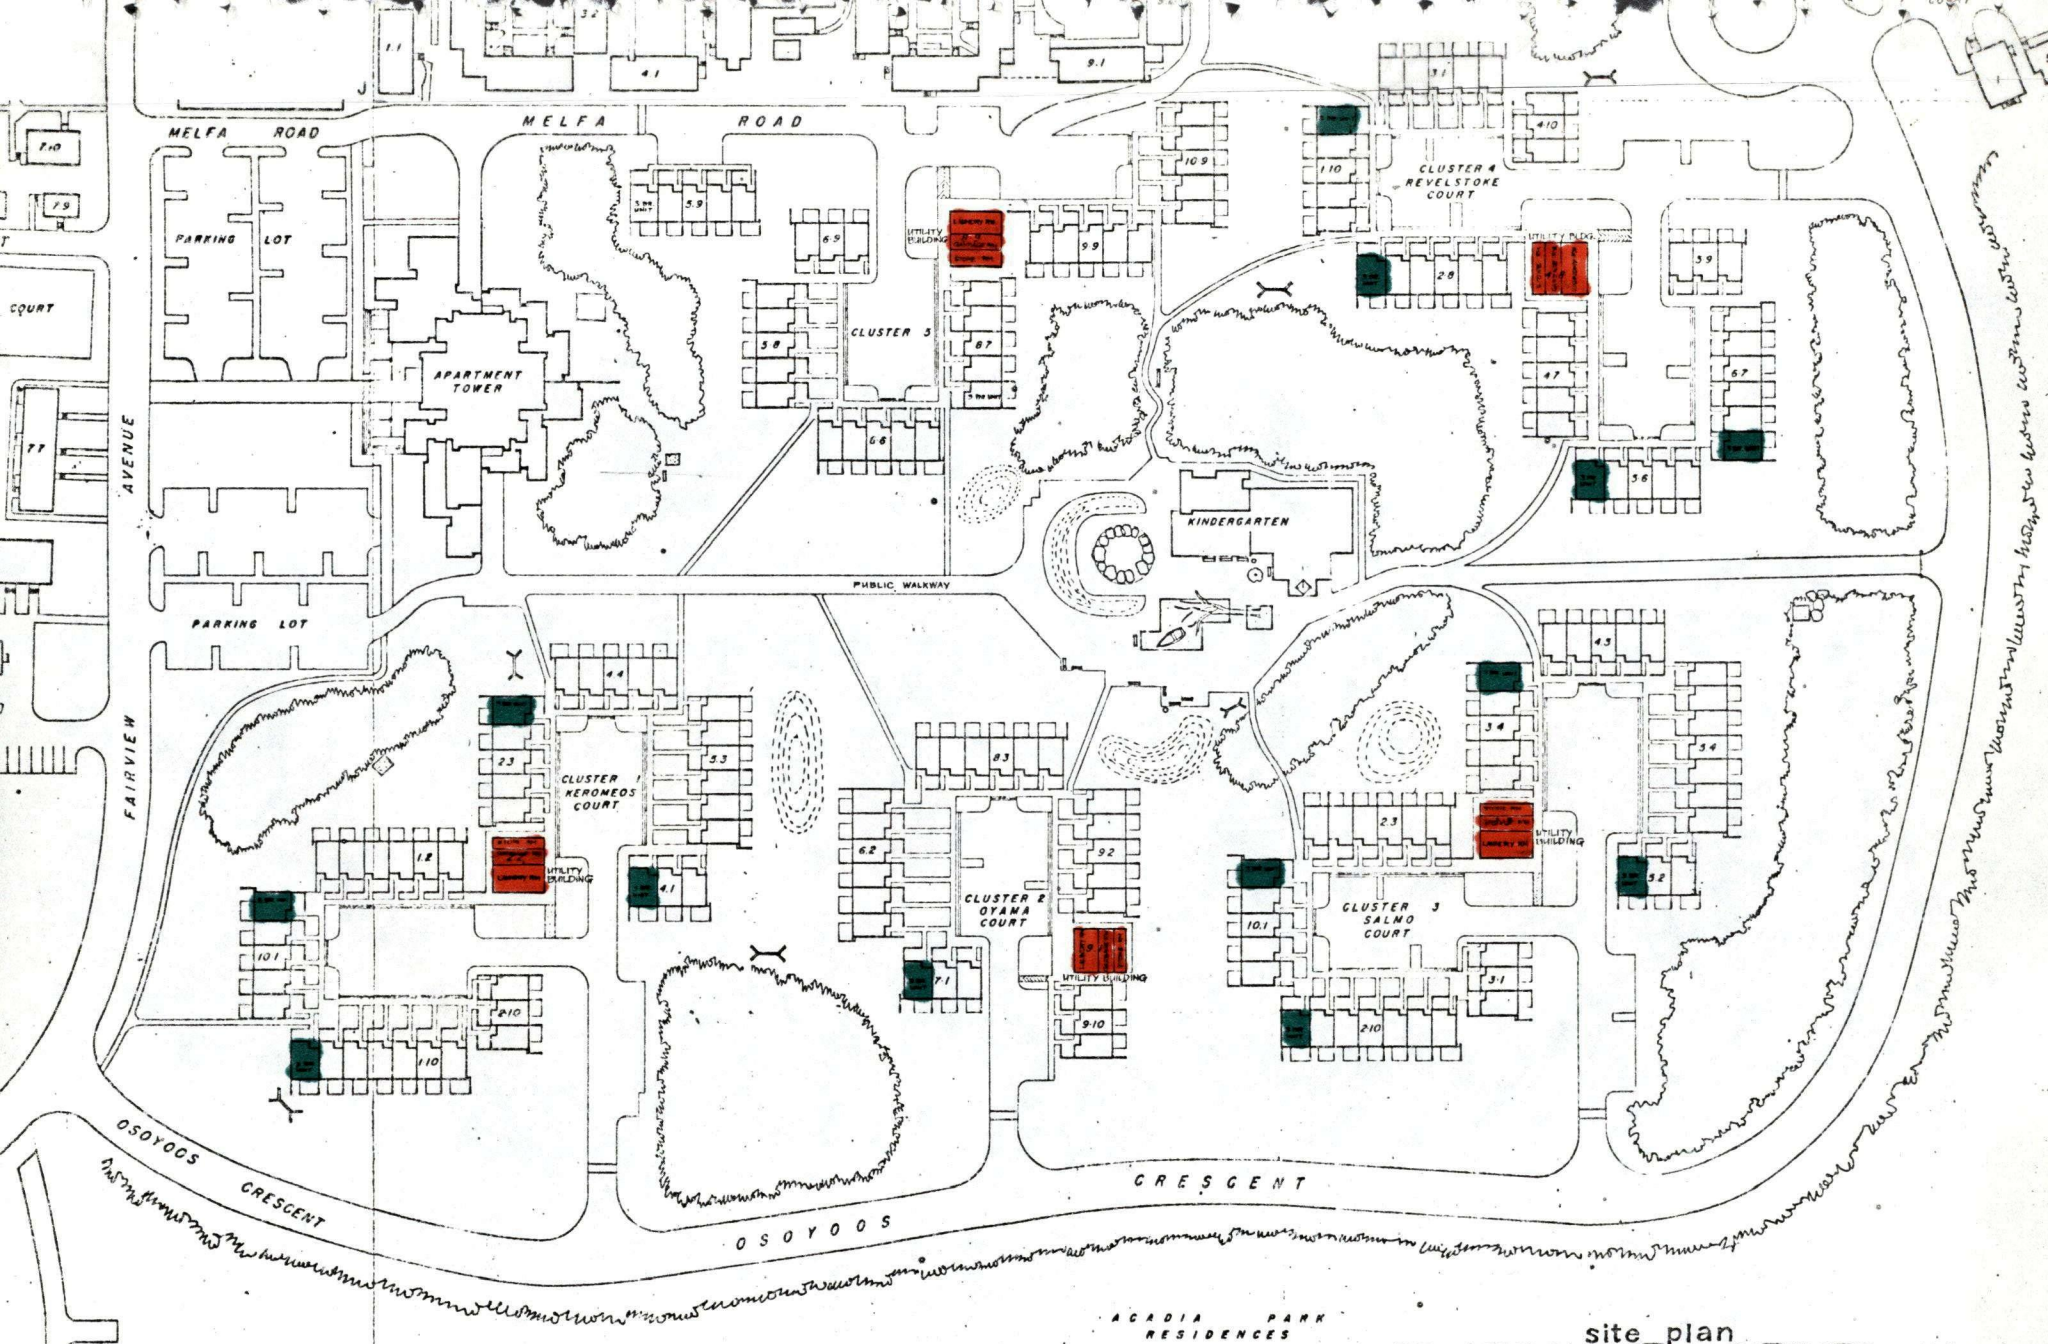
SITE PLAN OF THE ACADIA PARK CLUSTERS
